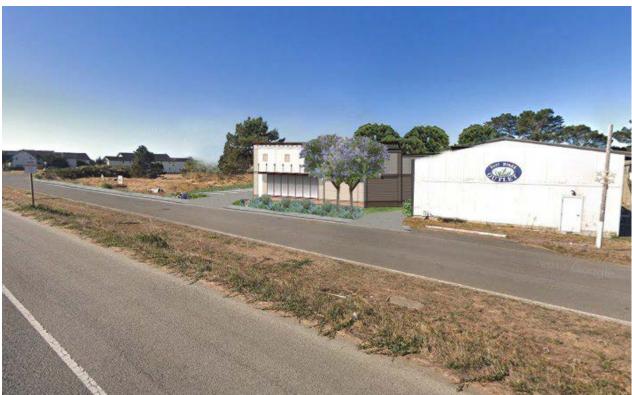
Proposed AutoZone re tail store site from CA Hwy 1, looking southwest
